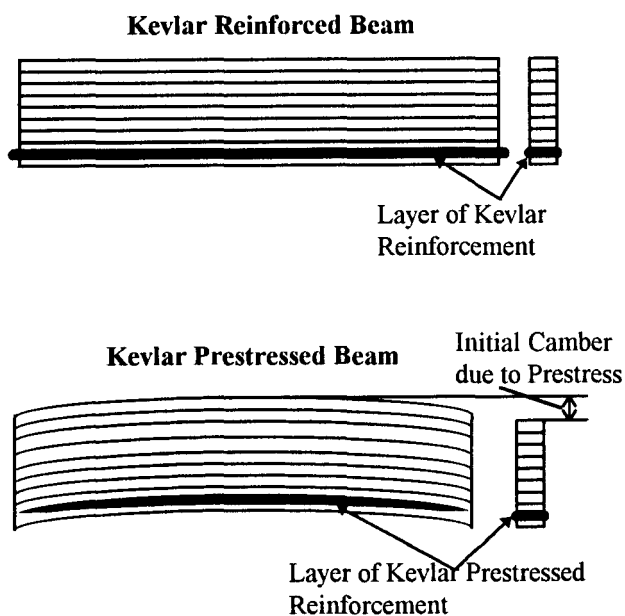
Kevlar Reinforced and Prestressed Glued Laminated Beams
